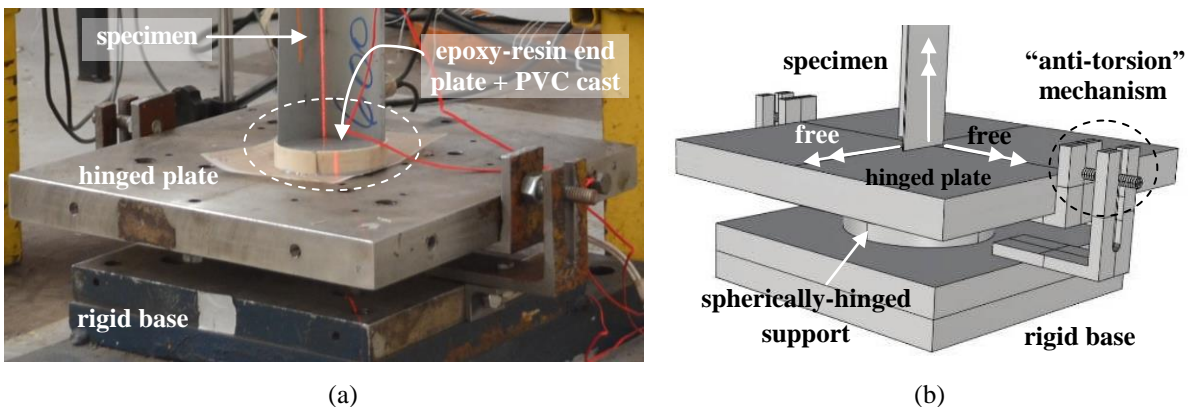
Specimen bottom spherically-hinged end support: (a) overall view and (b) 3D schematic representation.
